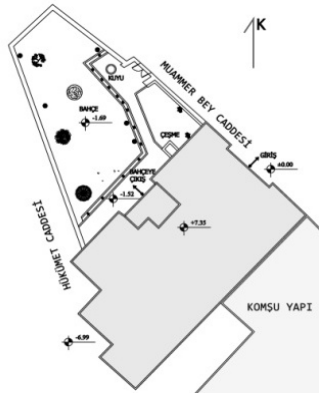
Plan Layout Diagram (Yağmur, Y., 2017; Talas Belediyesi, 2010).
